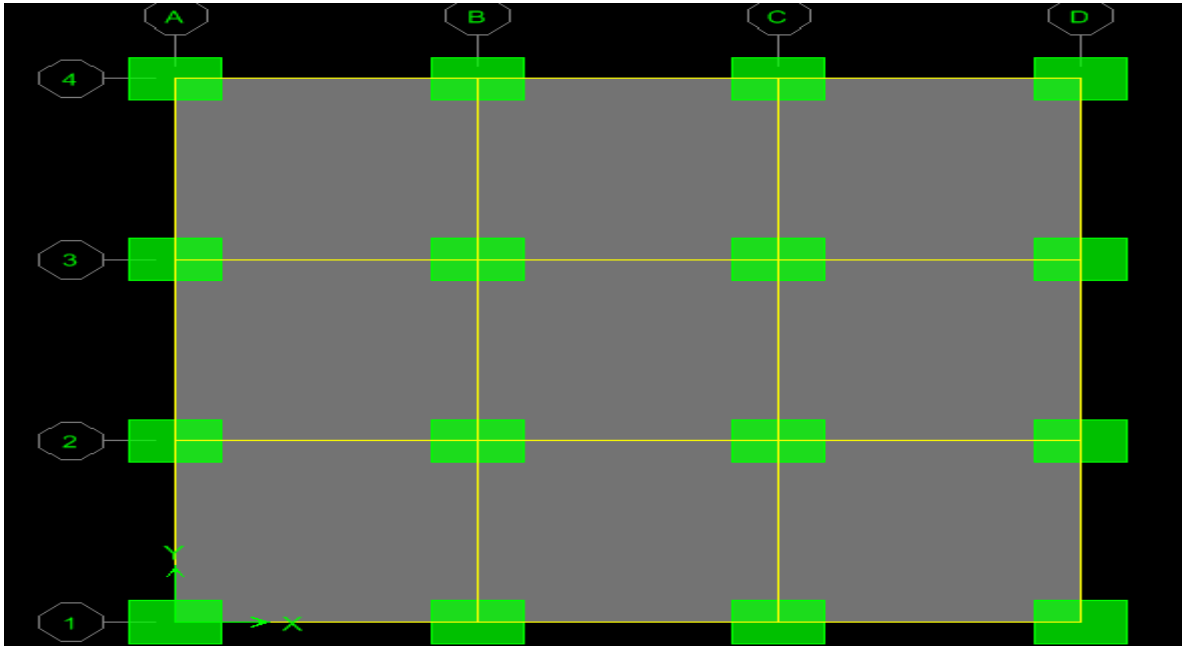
Plan of a G+9 storey framed home.(18m*18m)
